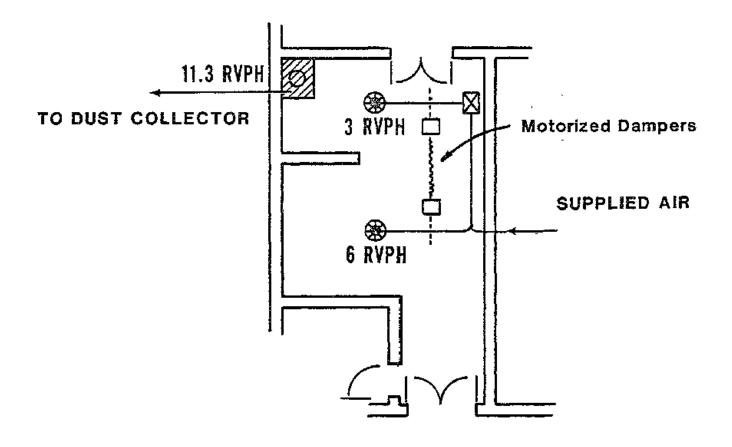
Plan View of Preweigh Room and General Ventilation Scheme
